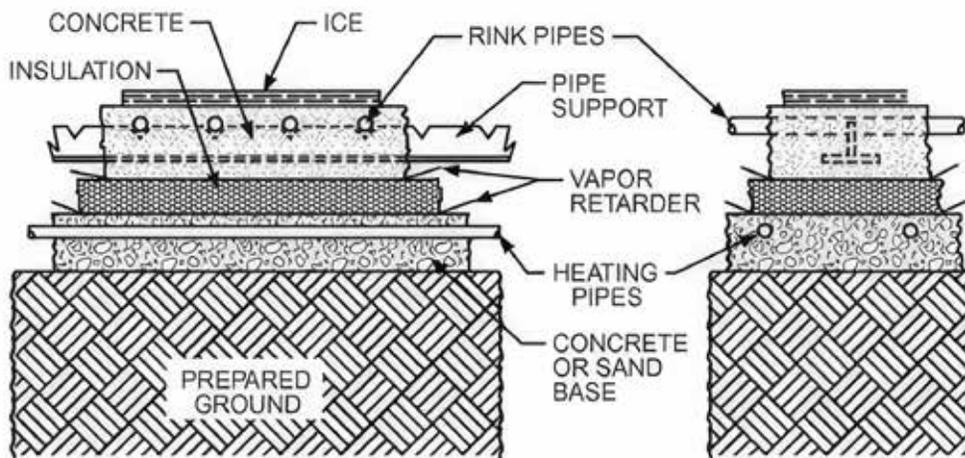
Typical layout of and ice rink floor (ASHRAE Refrigeration, 2014)
